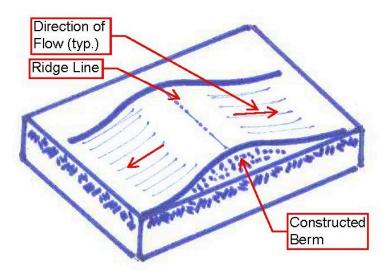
(Cross Sectional Diagram of a Constructed Berm)
